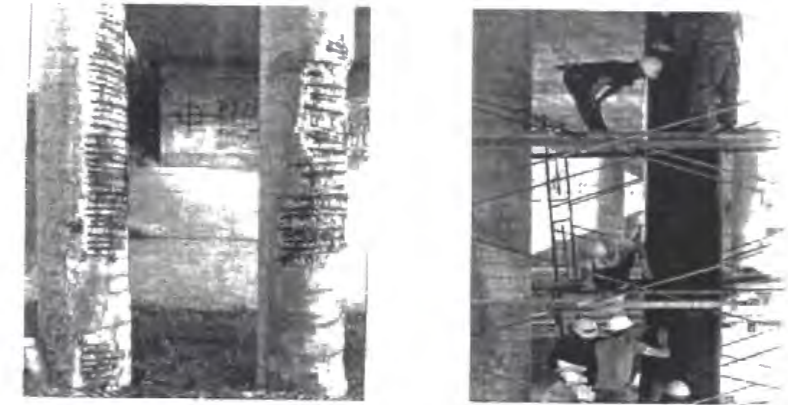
CFS retrofit of bridge column damaged by corrosion
